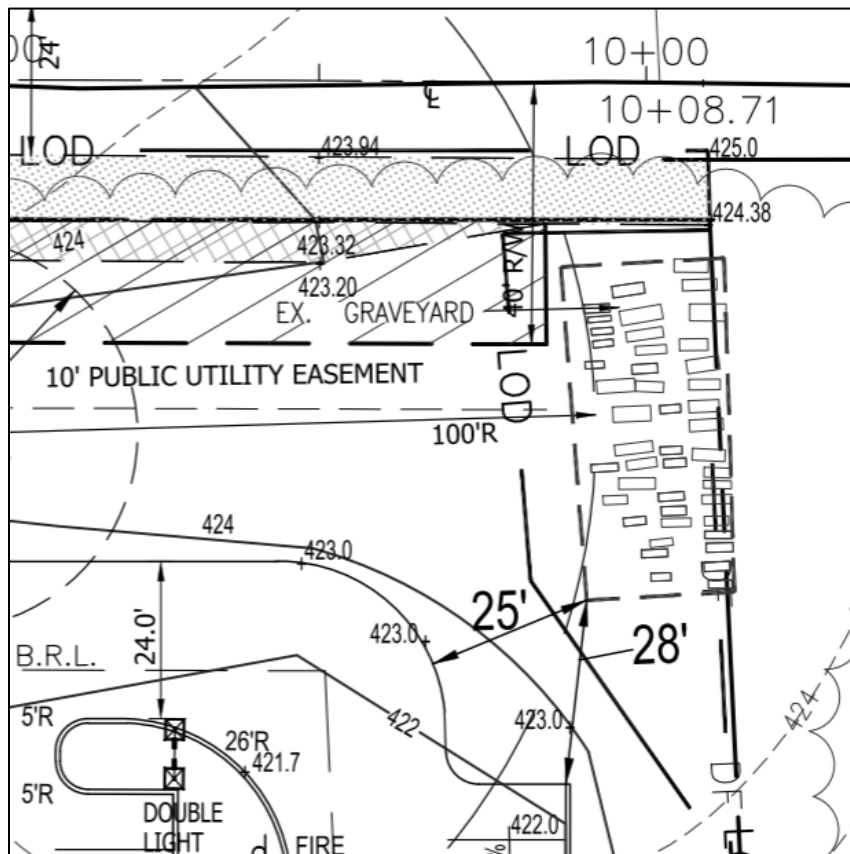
25 foot separation between the parking lot and the cemetery boundary
